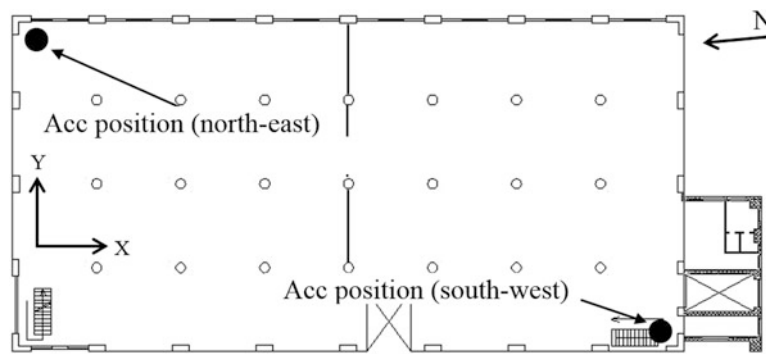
Plan view of second story showing removed walls and acceleration position in each story
